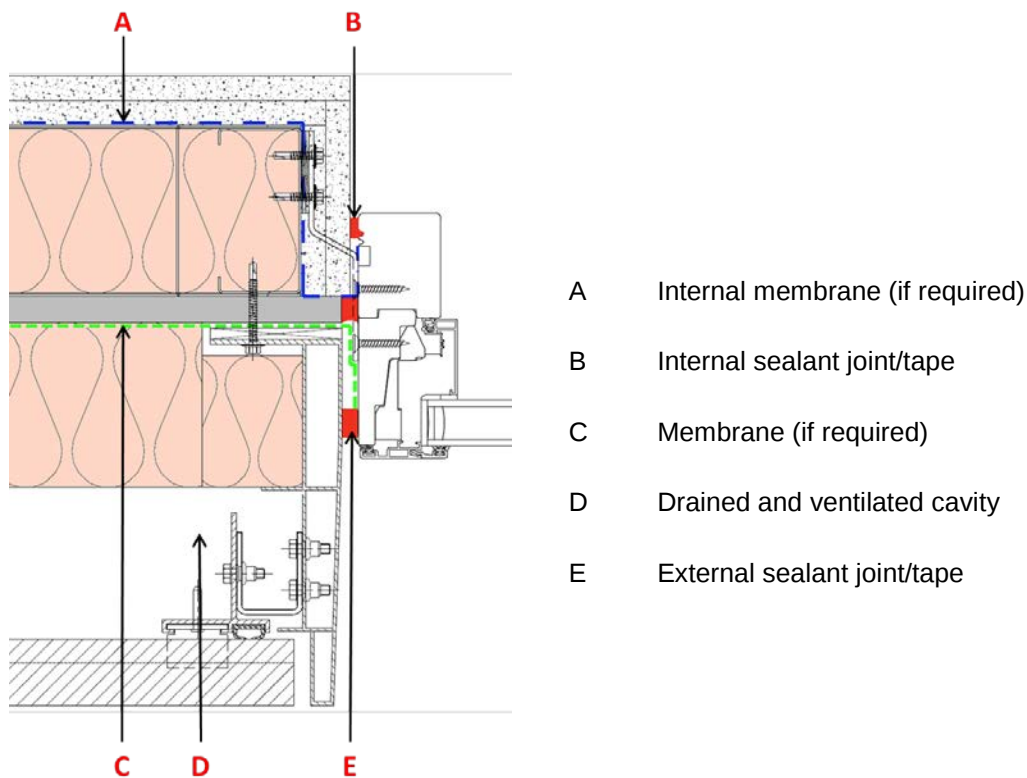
Window jamb interface with rainscreen, framed back wall (insulated)
